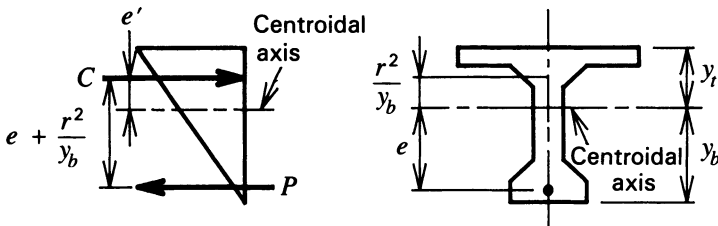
Relationship between prestressing force, pressure line, and section properties of a beam having zero stress in bottom fiber under design load. (a) Stress distribution. (b) Beam cross section.
